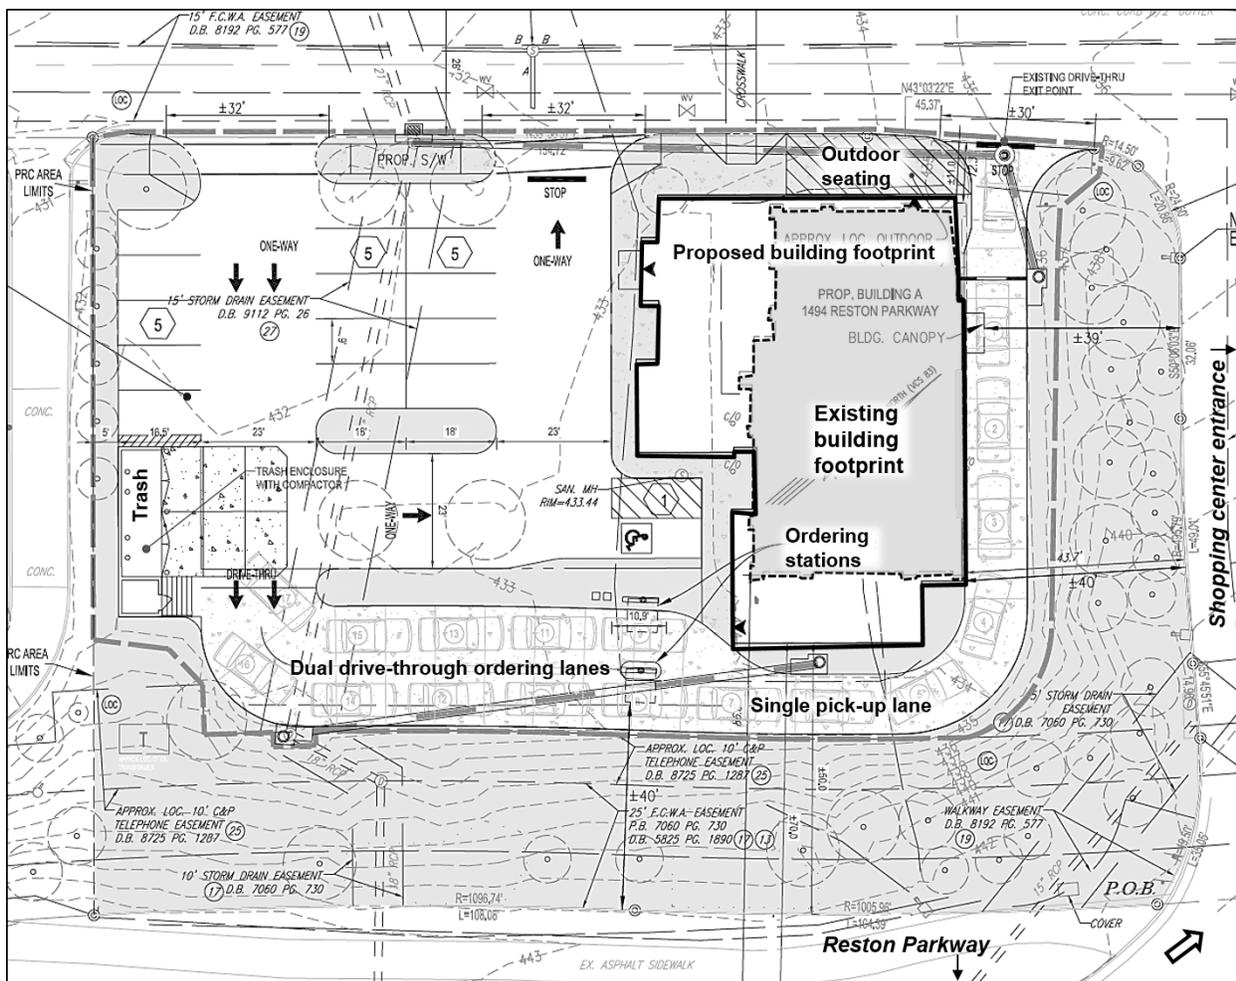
Site Layout, Source: Sheet 10, PRC Plan
